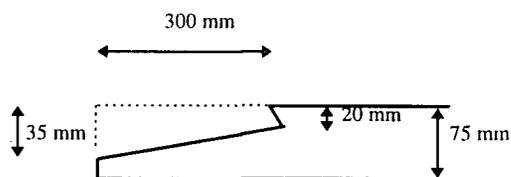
Dimensions to calculate the volume of insitu cast concrete over block walls
